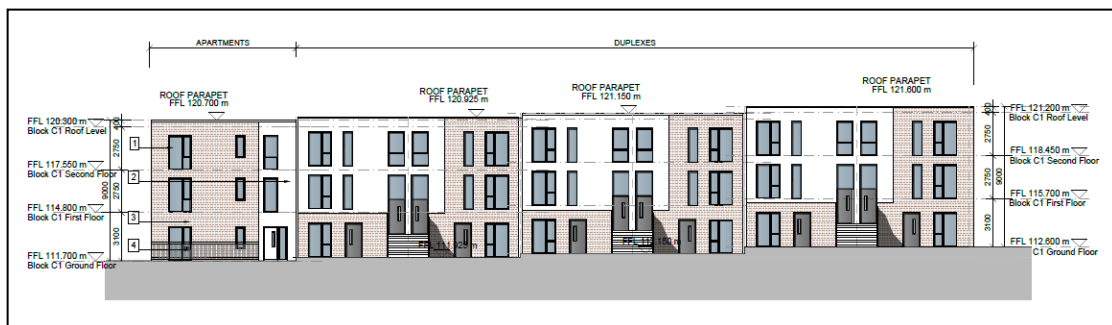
Block C1 East Elevation (Source: Drawing no. 3.1-203, prepared by RAU).
